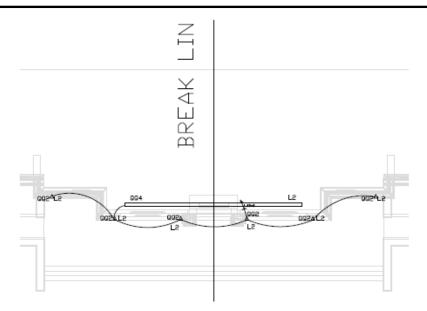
Second Floor Circuiting Plan – East Entry and Façade
